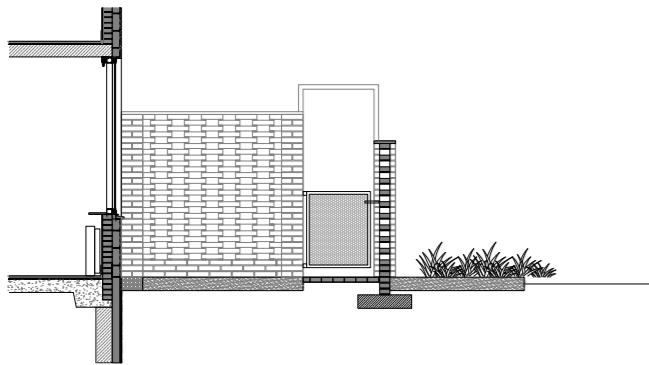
garden of ground-floor one-bay house as a link between interior and exterior
